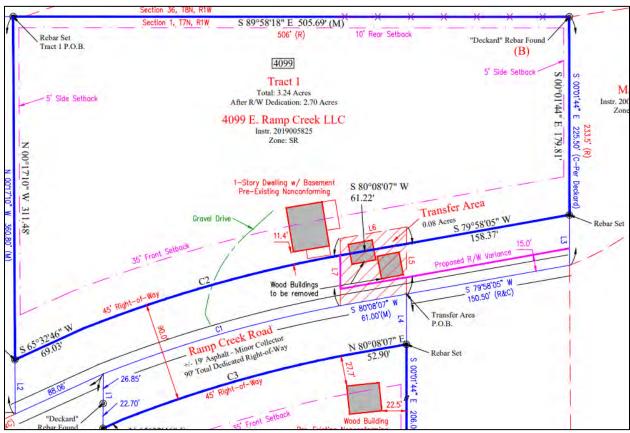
Area of interest for the right-of-way width waiver on the type "E" admin subdivision plat.
